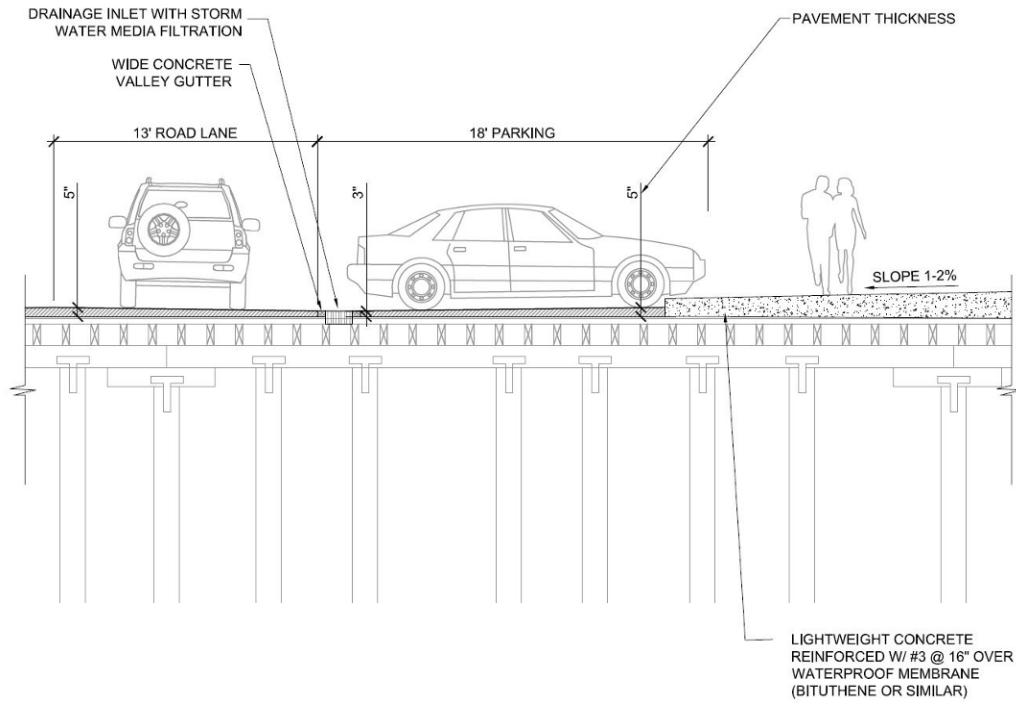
Grid Reinforced Pavement Design-Alt 2.1
